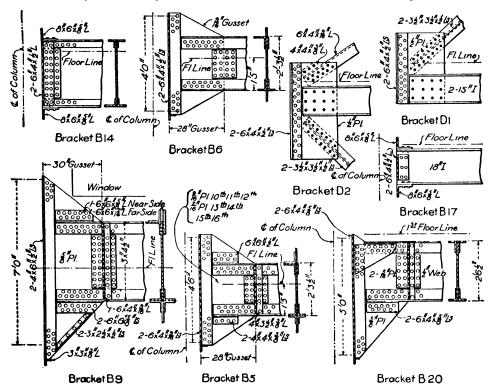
DETAILS OF WIND BRACING IN UNITED FIRE COMPANY'S BUILDING. (Eng. Record, Dec. 9, 1911.)
